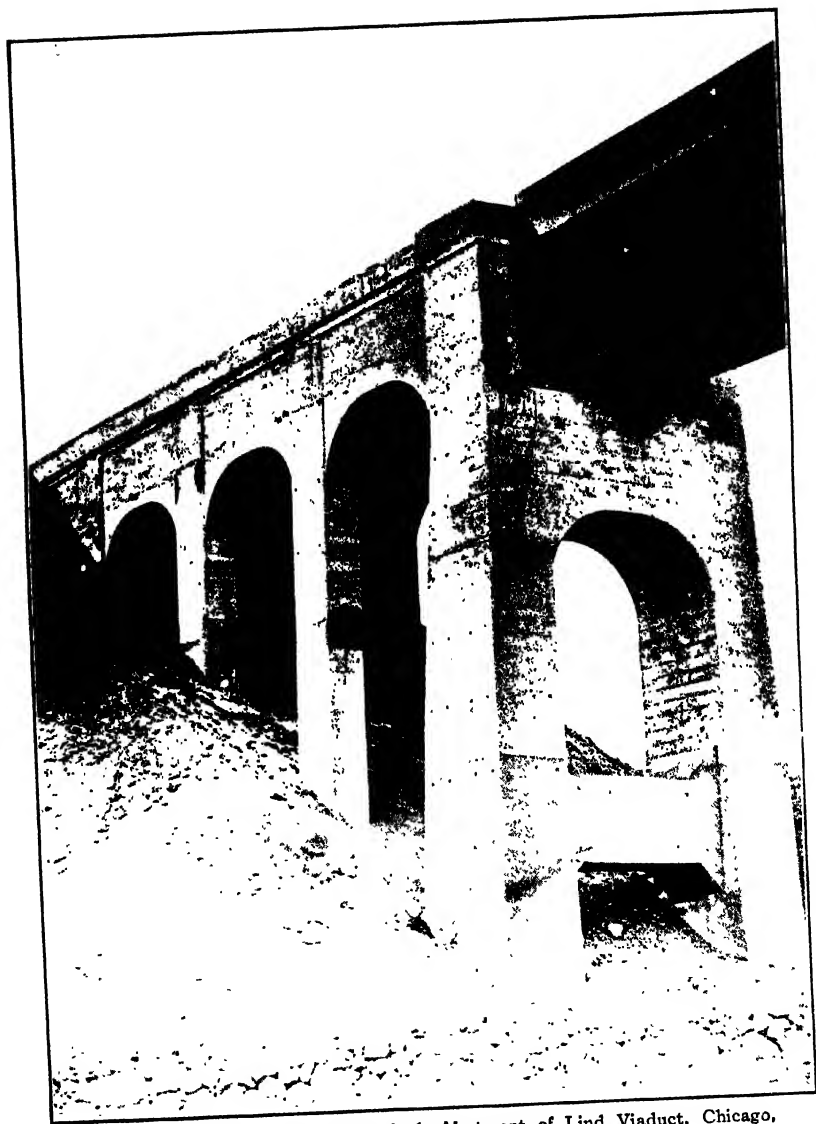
Reinforced-Concrete Arch Abutment of Lind Viaduct, Chicago, Milwaukee, and St. Paul Railway. Built in 1909.
